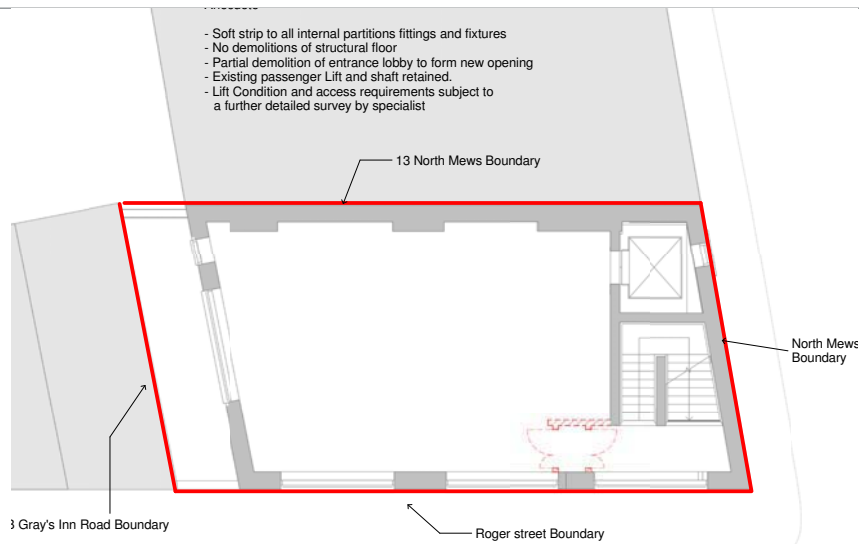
FIRST FLOOR DEMOLITIONS
